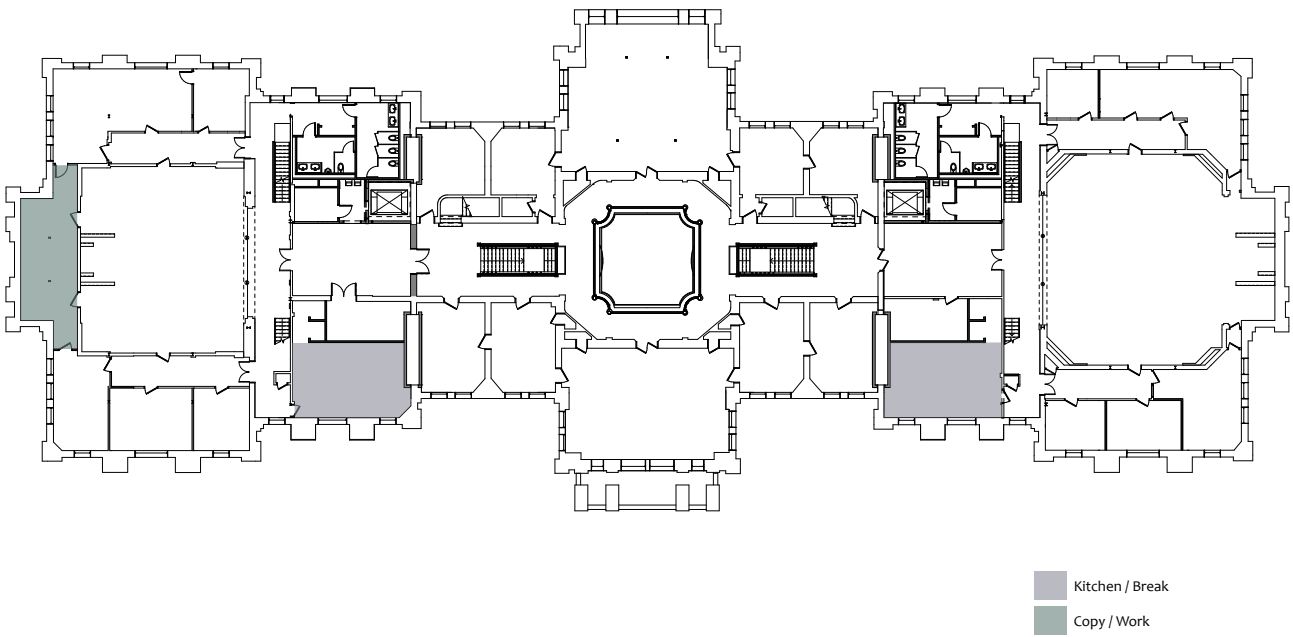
Proposed Kitchen/Break and Copy/Work Rooms - Second Floor [Capitol]
